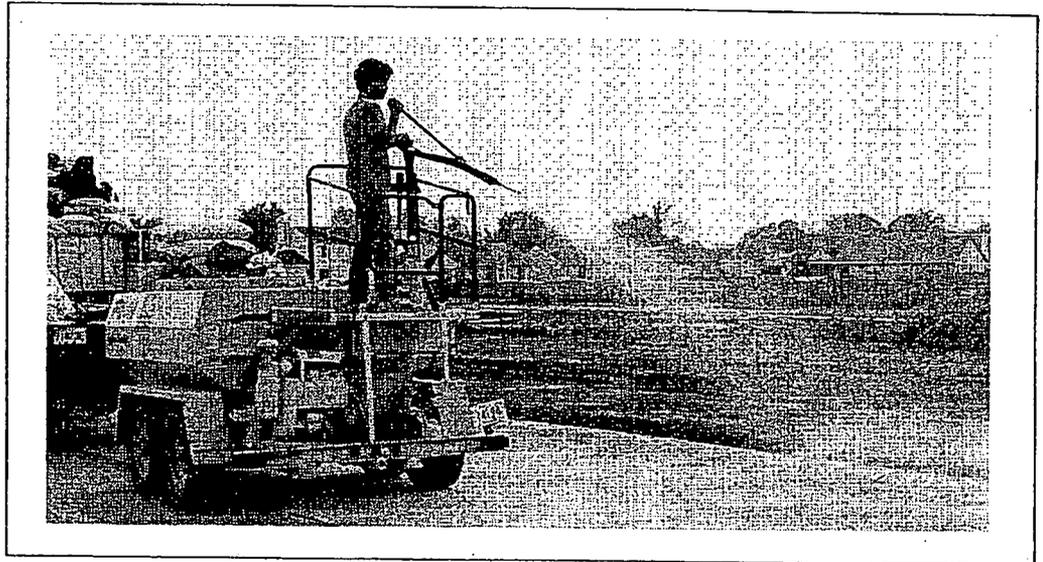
F. Hydroseeding the roadside in a new subdivision.
